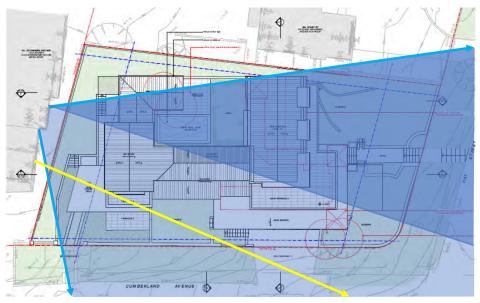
View corridors from 78 Cumberland Avenue over the subject site
